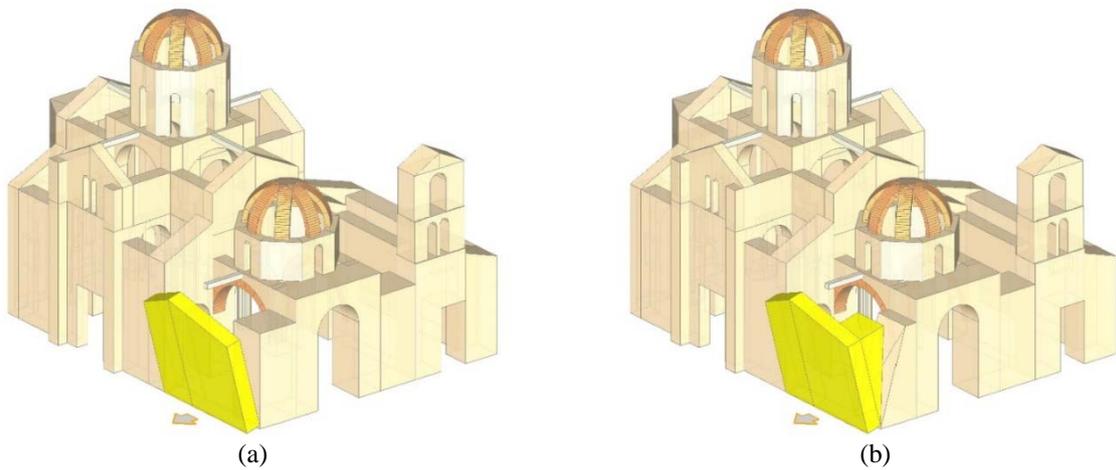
a) M05 - Overturning of a north wall; b) M06 – Overturning of a north wall wide one side wing.
